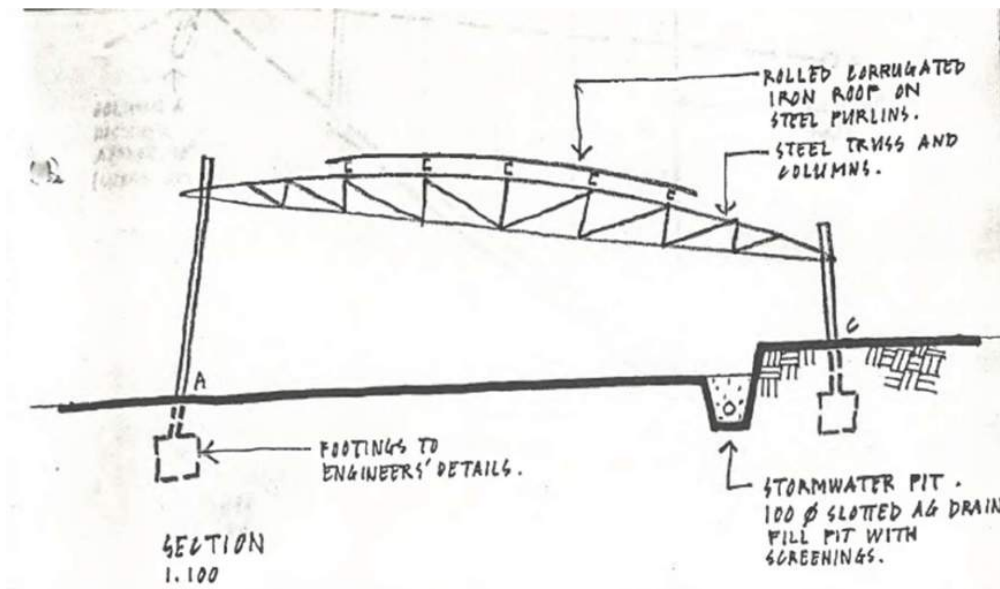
Plans for car port at the Choong House by architects Wood Marsh. (Source: BP, undated)
